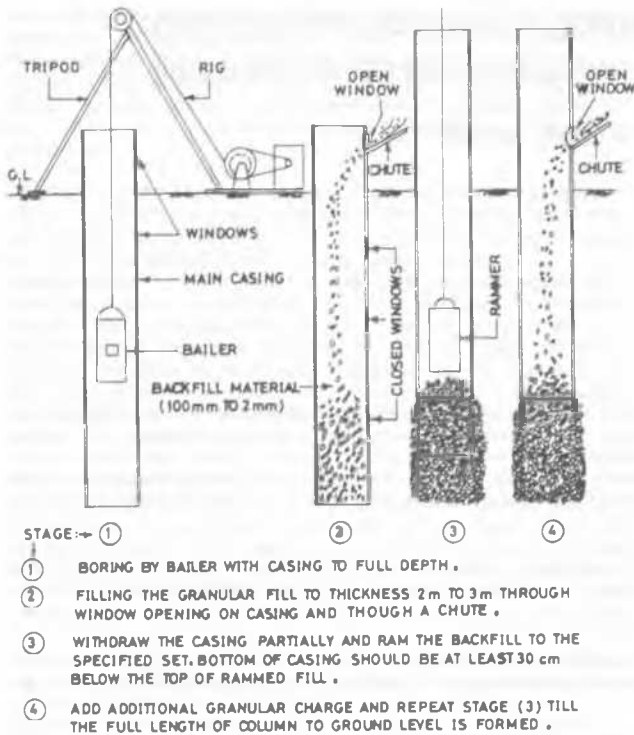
Stages of Construction of Rammed Stone Columns by Piling Equipment
